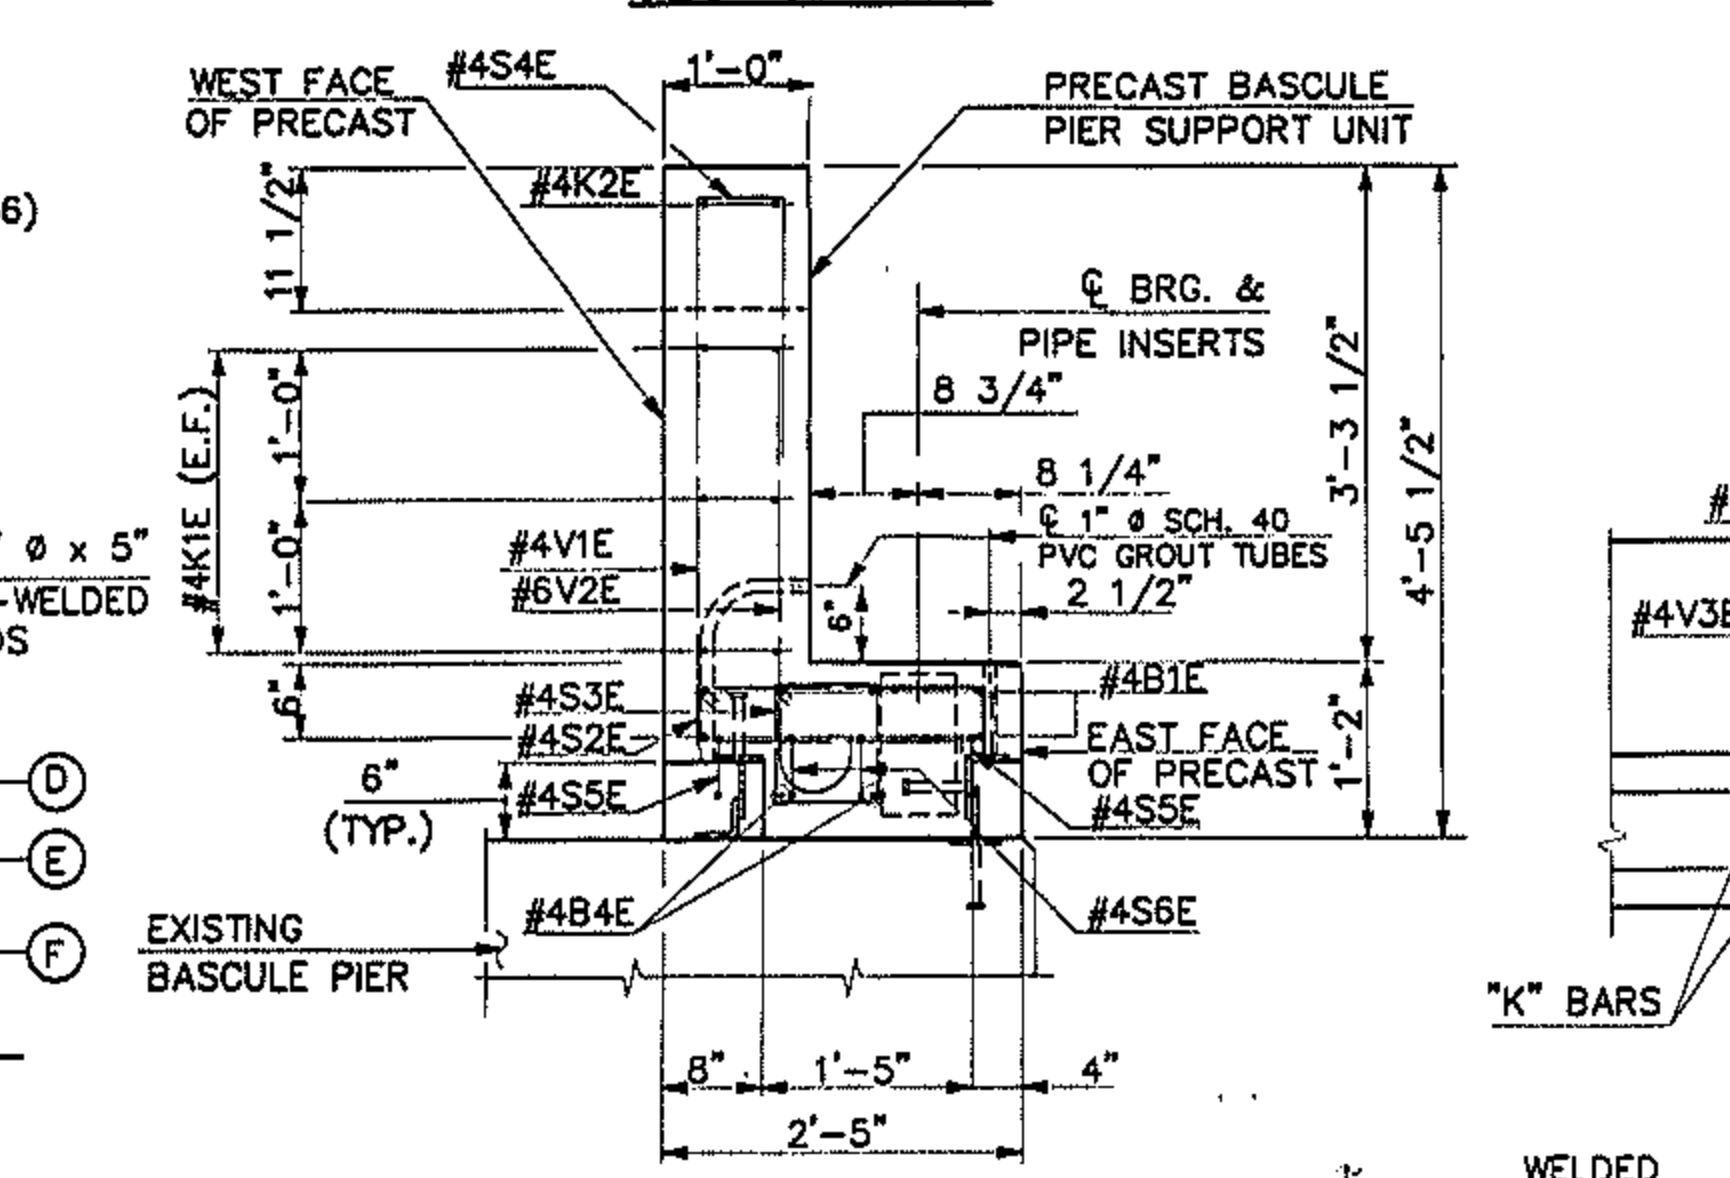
DETAILS OF ANCHORAGES @ WEST FACE OF BASCULE PIER SUPPORT
